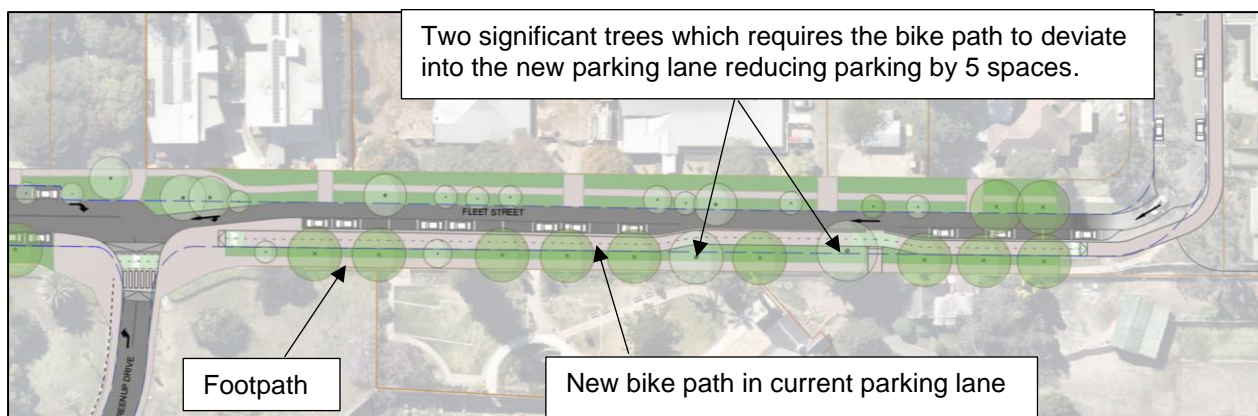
Fleet Street between Greenup Drive and Fennell Street.
